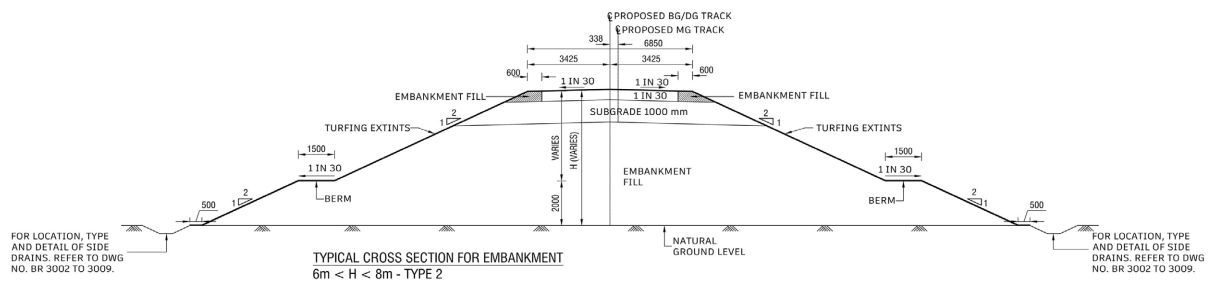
Typical cross section for embankment height 6 m to 8 m (Type 2).
